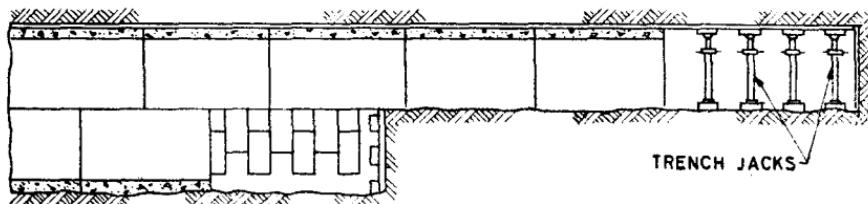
FLYING ARCH METHOD OF TUNNELING
